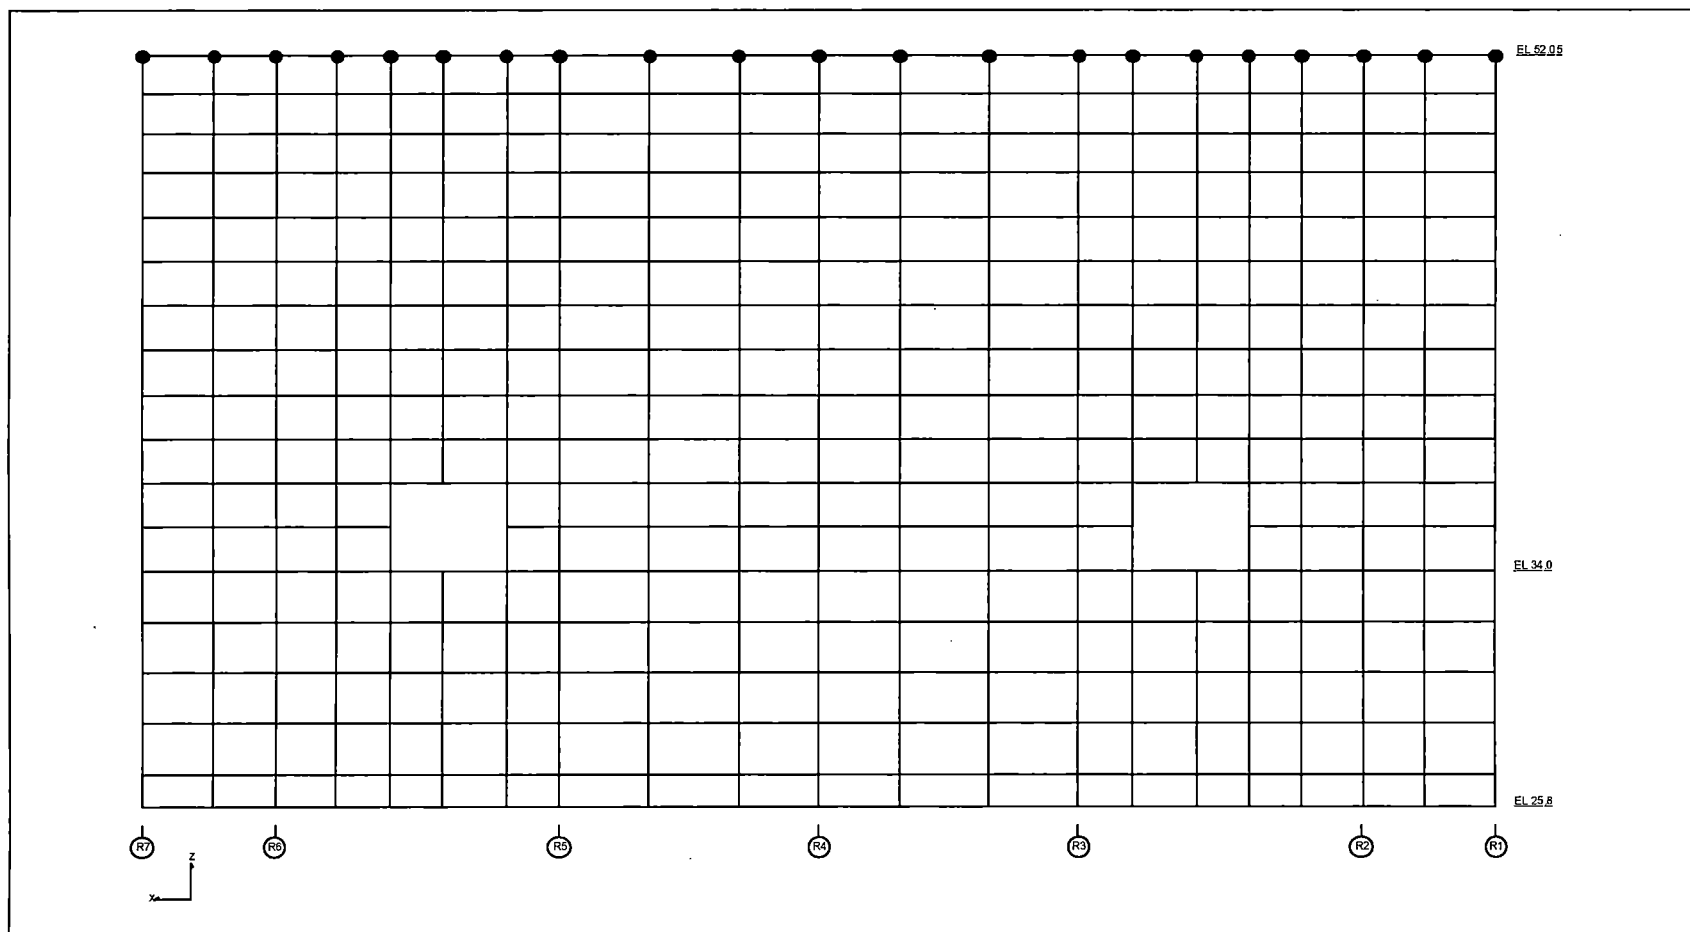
Application of Overturning Moments to the External Wall on RB Column Line
